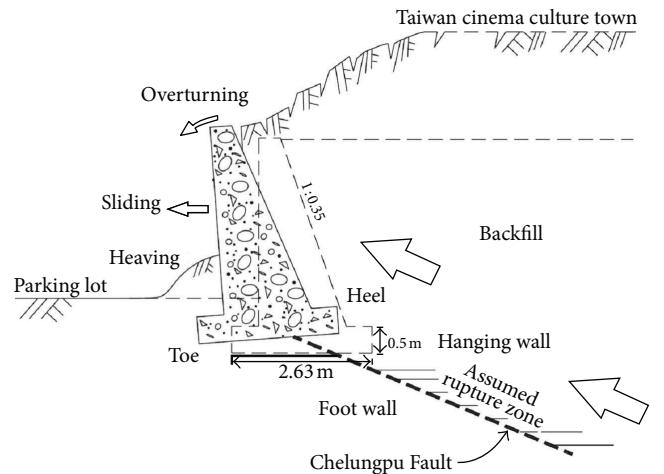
Geometry and failure mechanism of a retaining wall in Chi-Chi Earthquake, Taiwan (after [15]).
